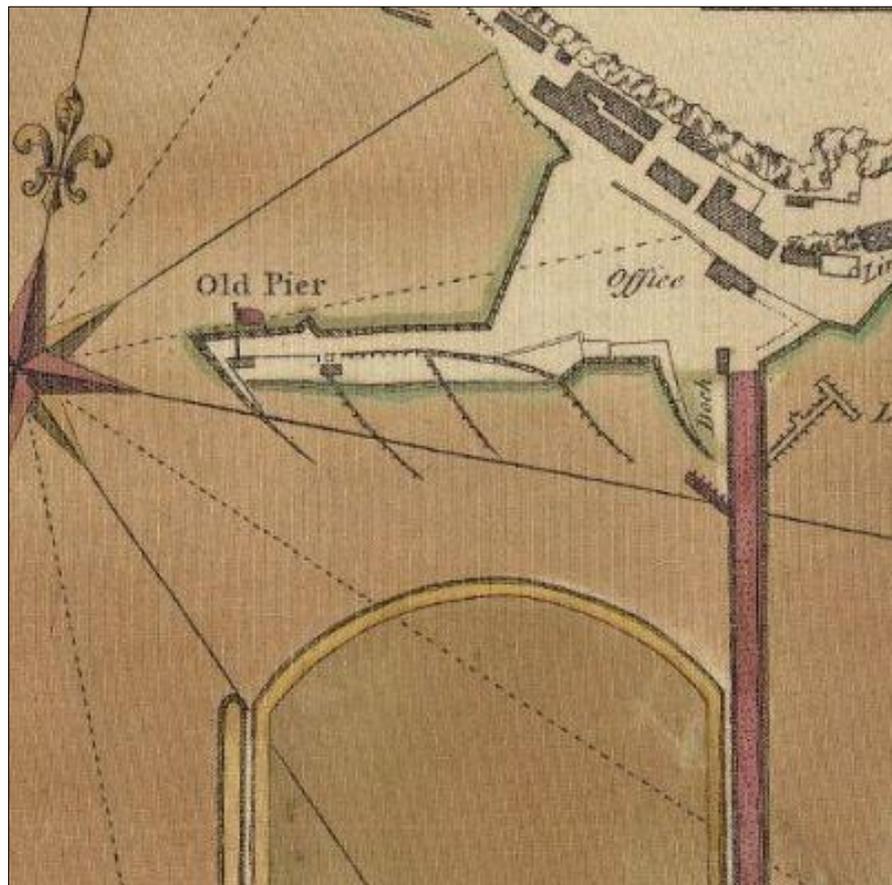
, Detail of the 1755 plan showing old timber pier in greater detail
